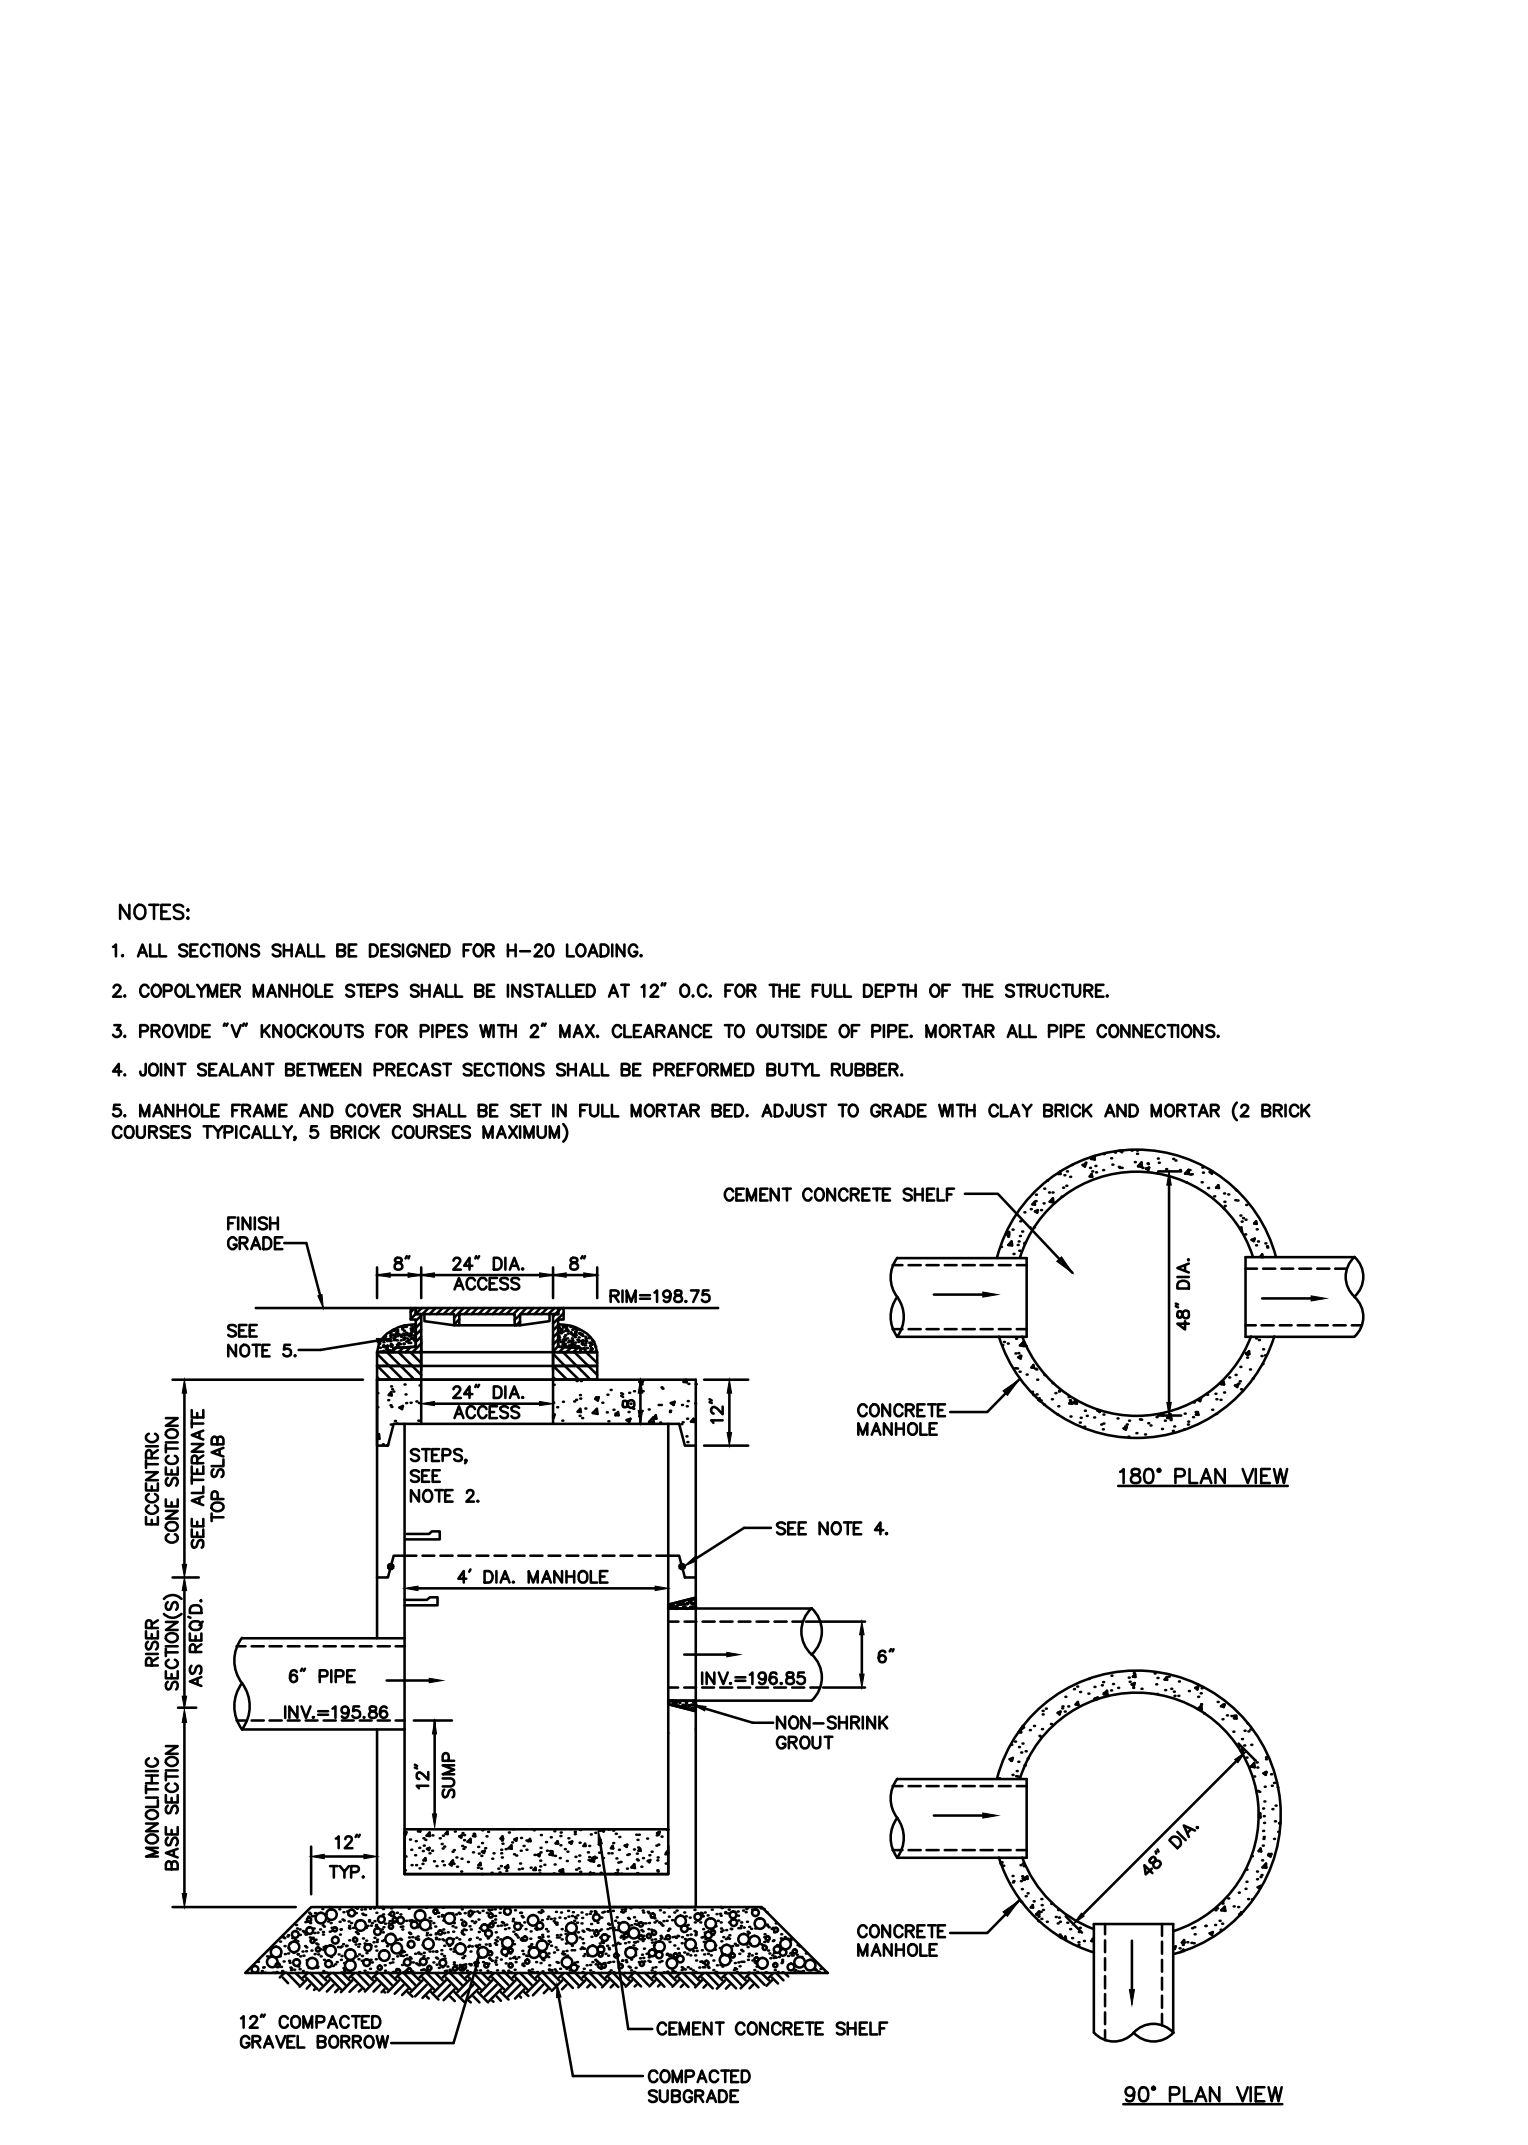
DRAIN MANHOLE (DMH) JDE
